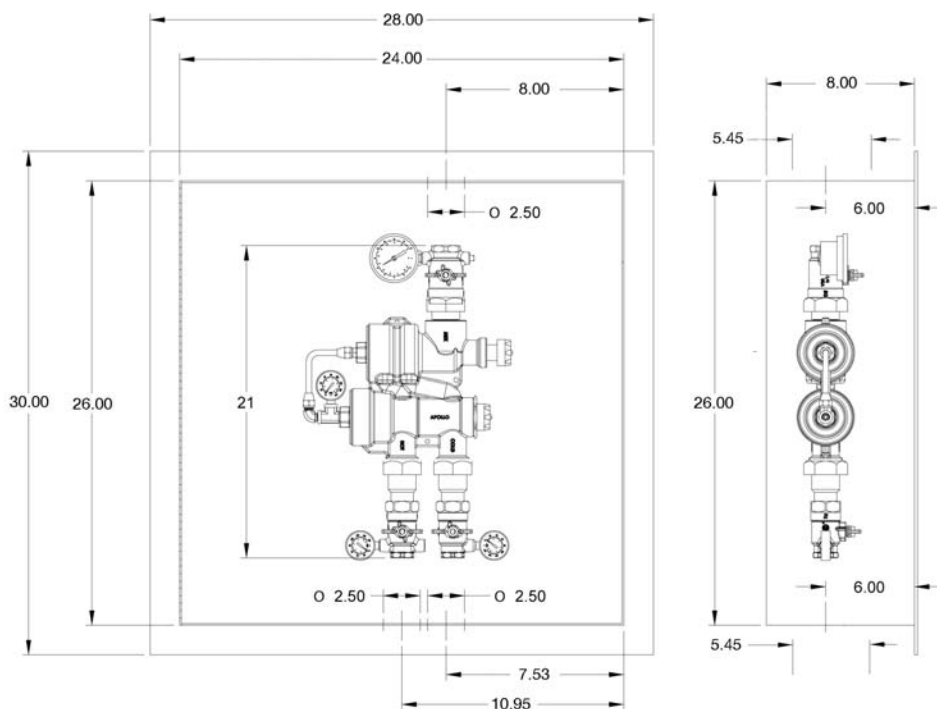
Typical Valve Dimensions with Stainless Steel Recessed Cabinet Option
